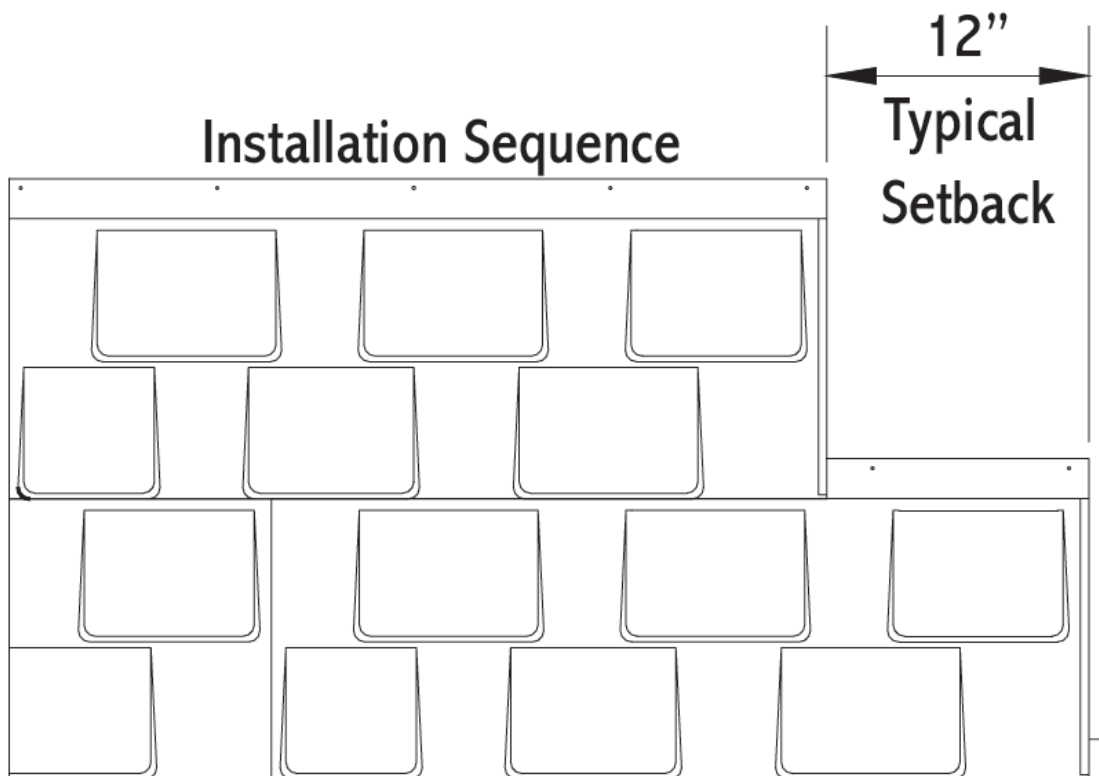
ADVANTA® SHINGLE ROOF PANEL INSTALLATION SEQUENCE
